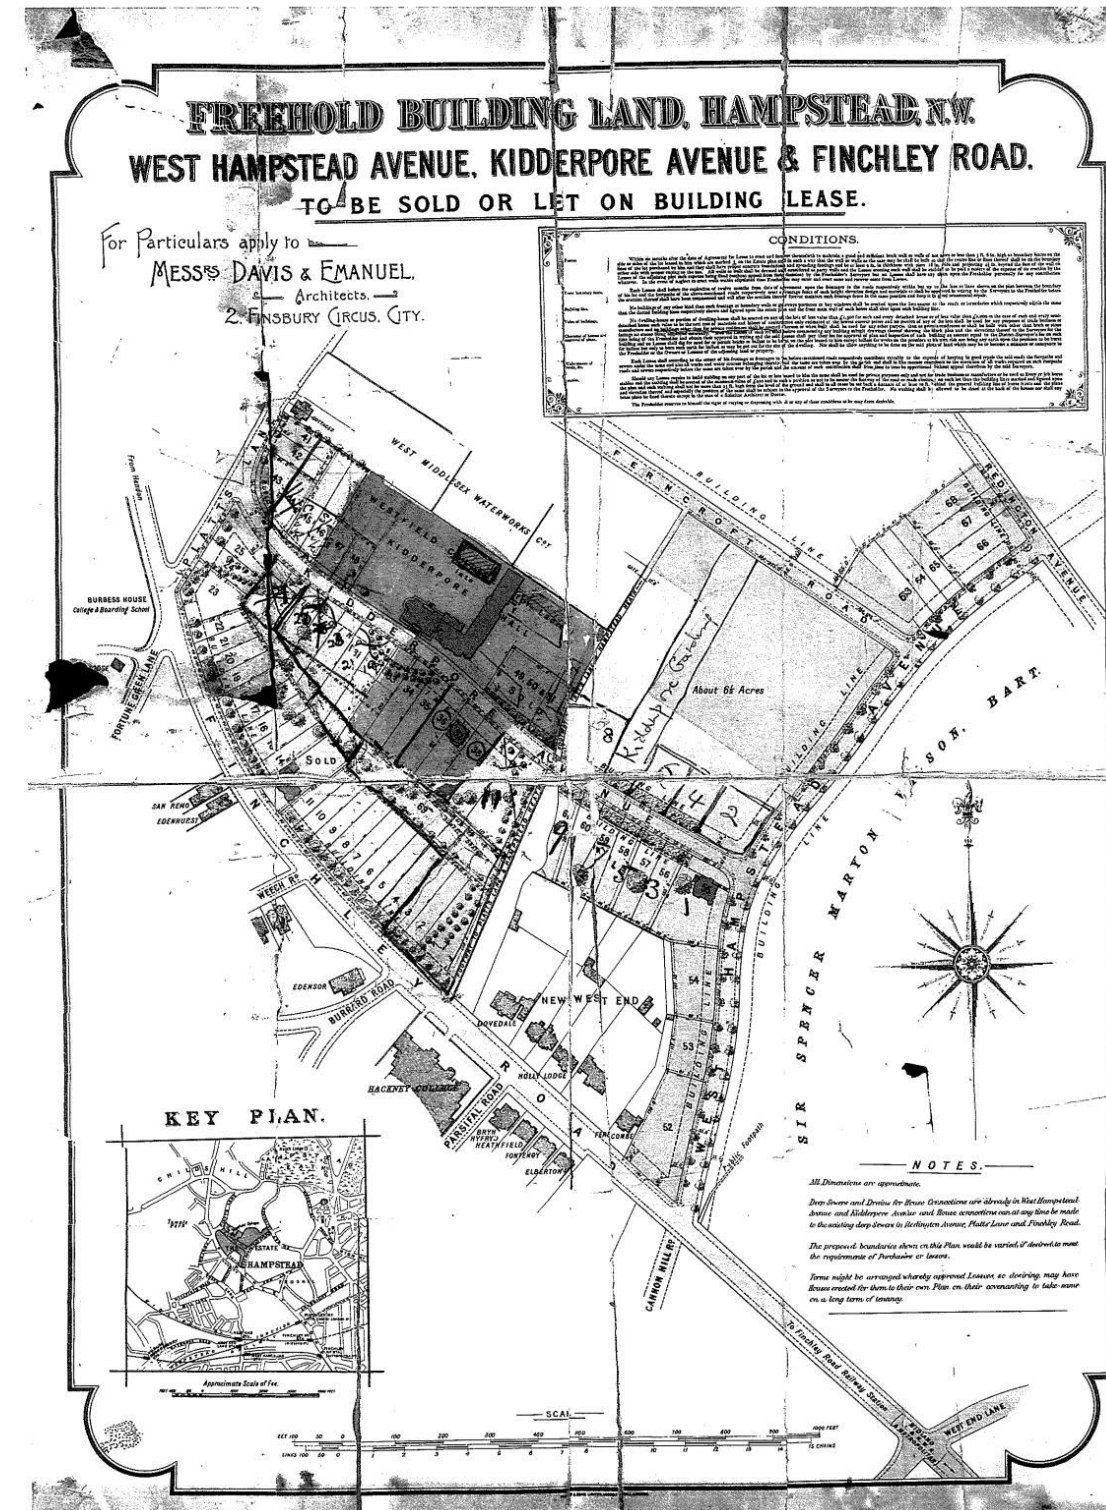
An extract from the Davis and Emmanuel building plan for the Kidderpore Hall Estate. This plan was produced in 1892.
